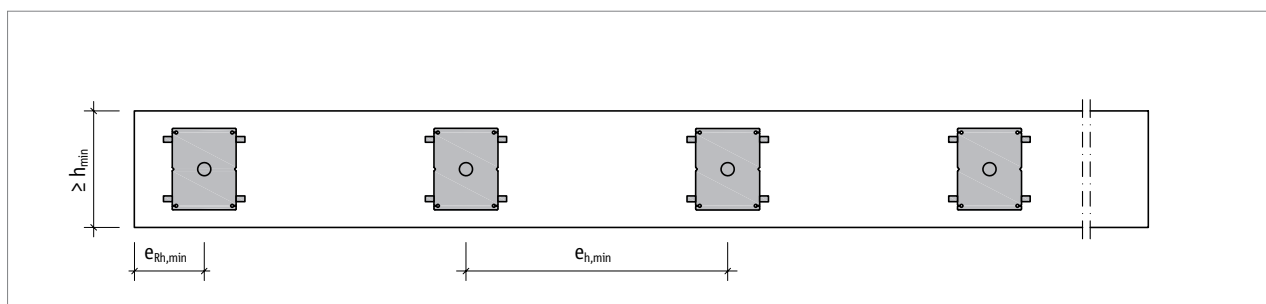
Schöck Stacon® type SLD: Minimum structural component measurements and dowel spacings with one slab
